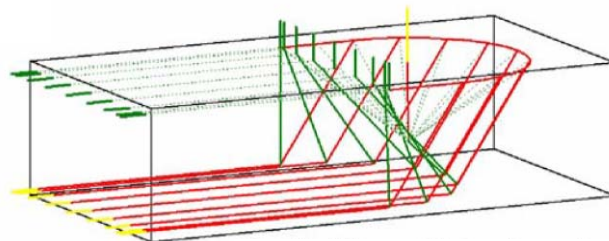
Three-dimensional strut-and-tie model of column-to-foundation connection, foundation shown only (*Bruckner, M. (2006)*)
